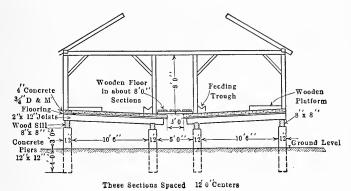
Typical Section through Hog House Proposed at Worcester, Mass.
